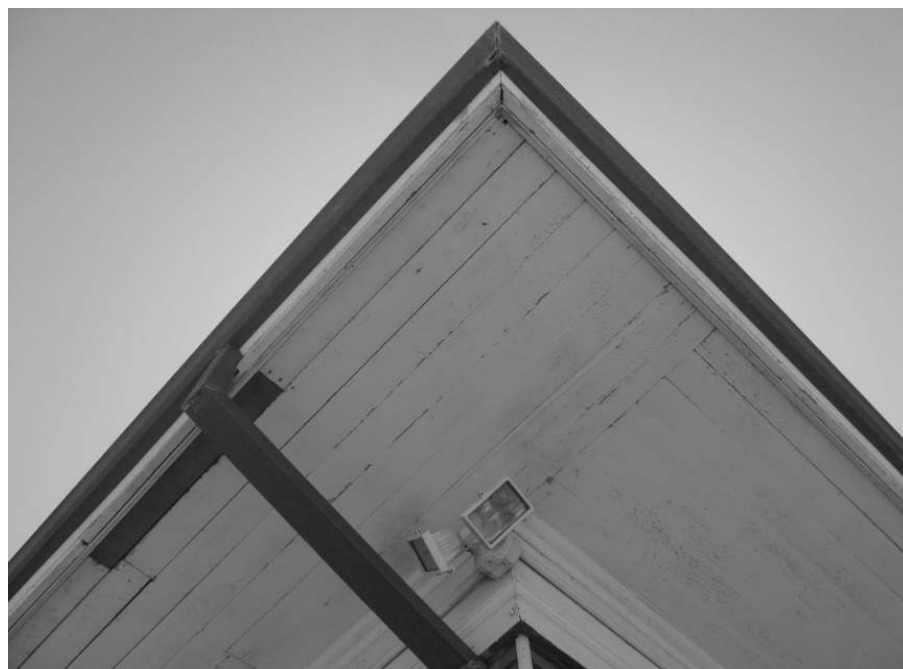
Detail of broadly overhanging eaves, northeast corner.
